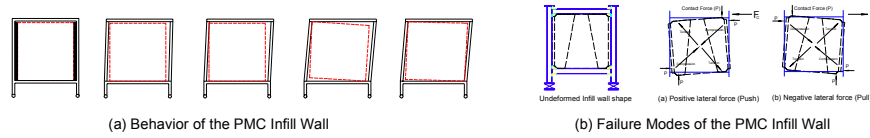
The Behavior and Failure Modes of the PMC Infill Wall
